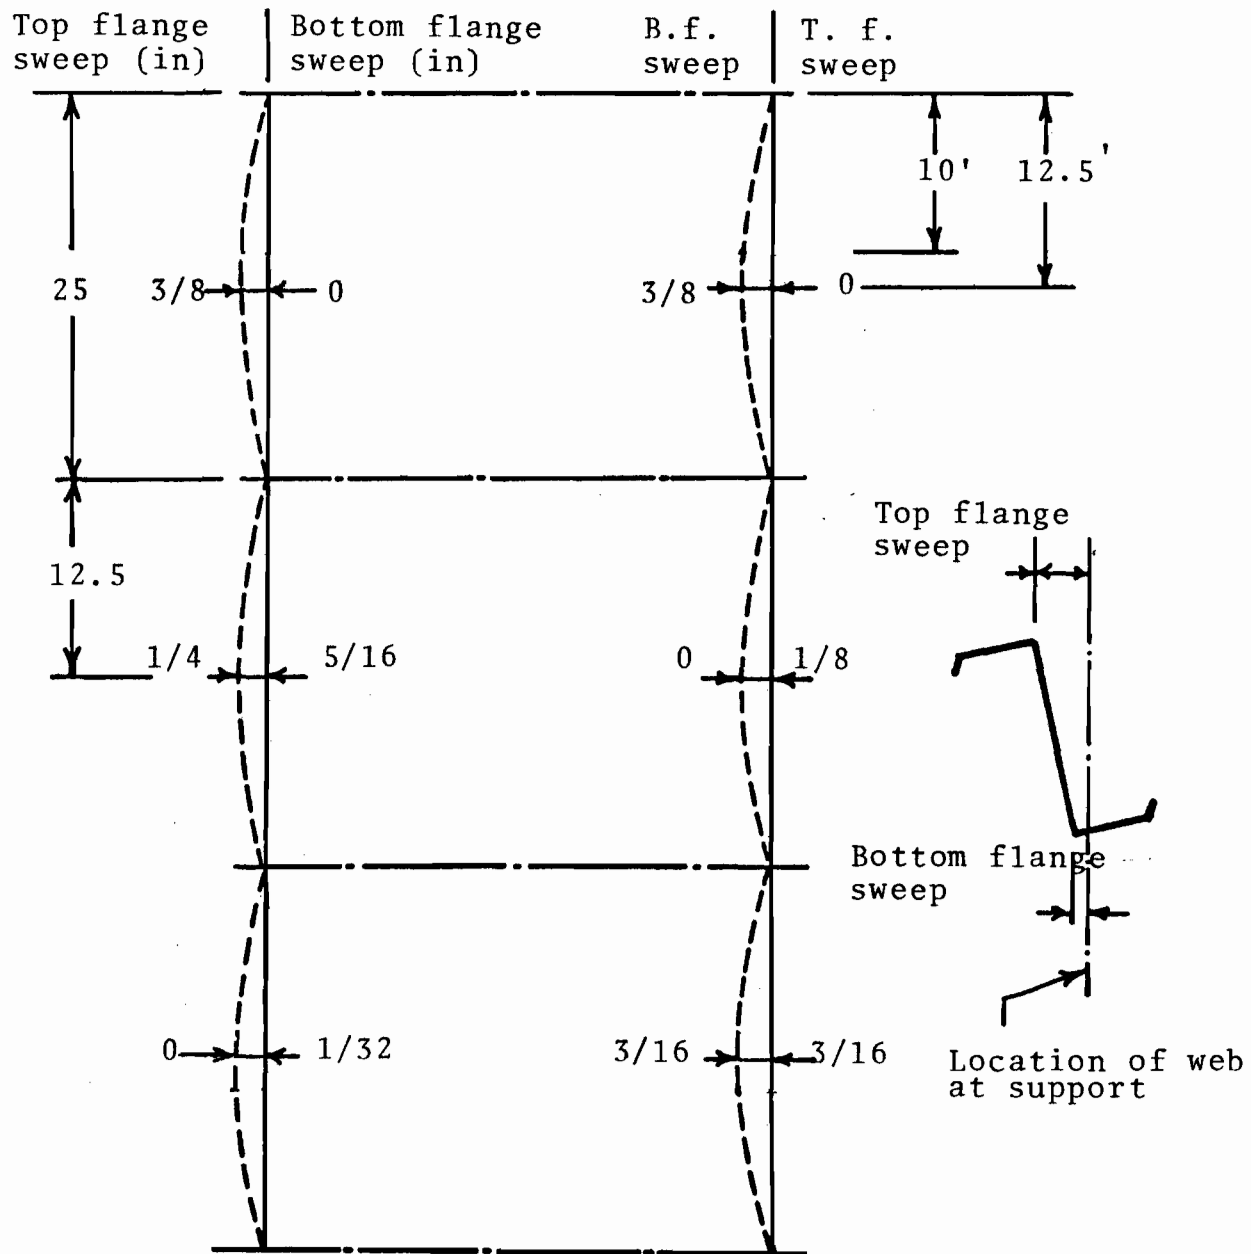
Initial Sweep of Z-Section Purlin Assembly - Second Test
